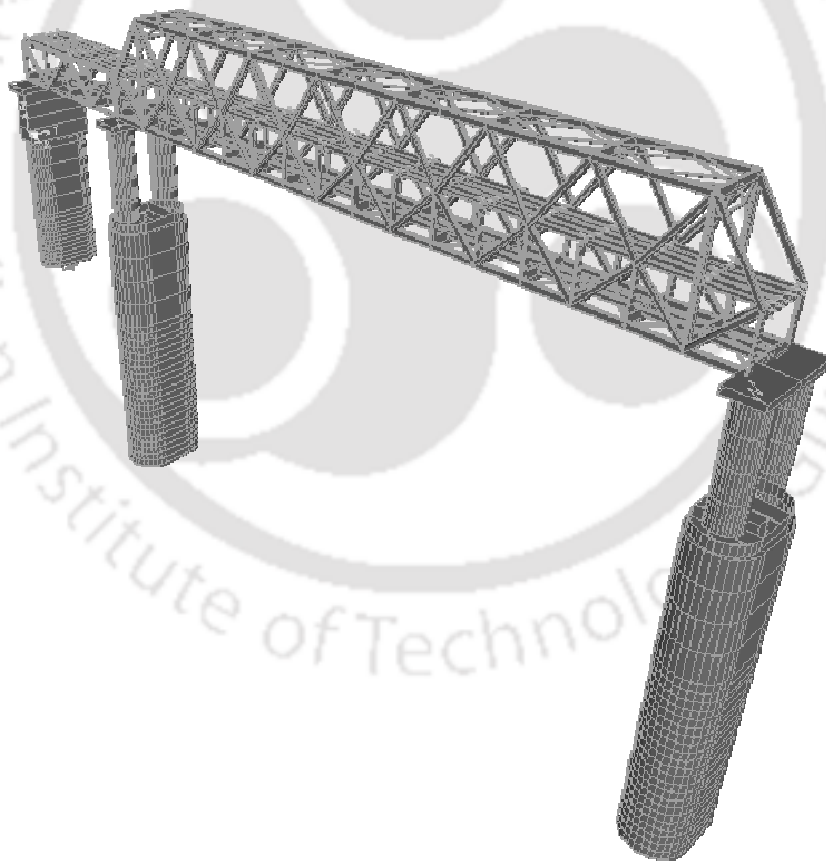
Finite element model of Saraighat Bridge for one main-span and the connected approach-span
